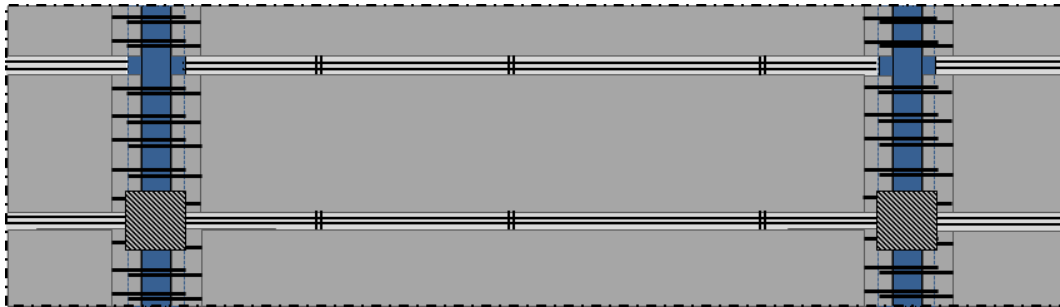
typical column-beam-floor slab assemblage in-situ
